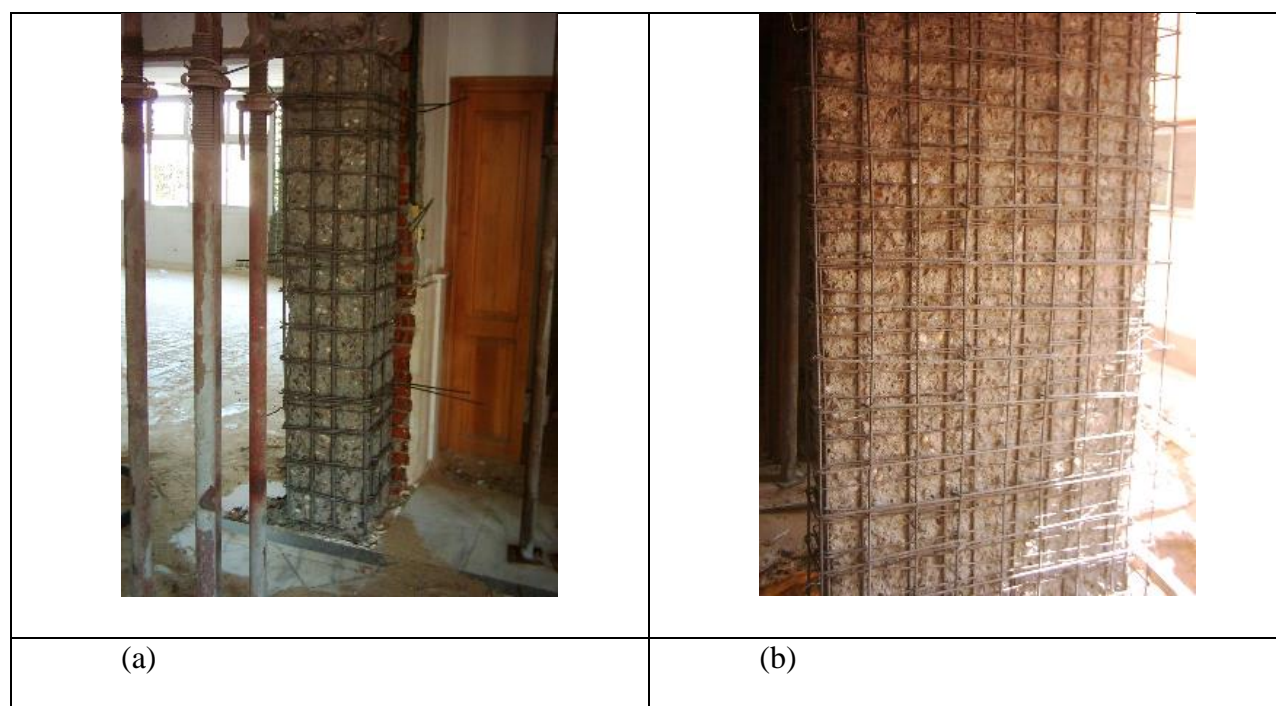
Sand blasted steel and new steel (a) interior column, (b) exterior column
